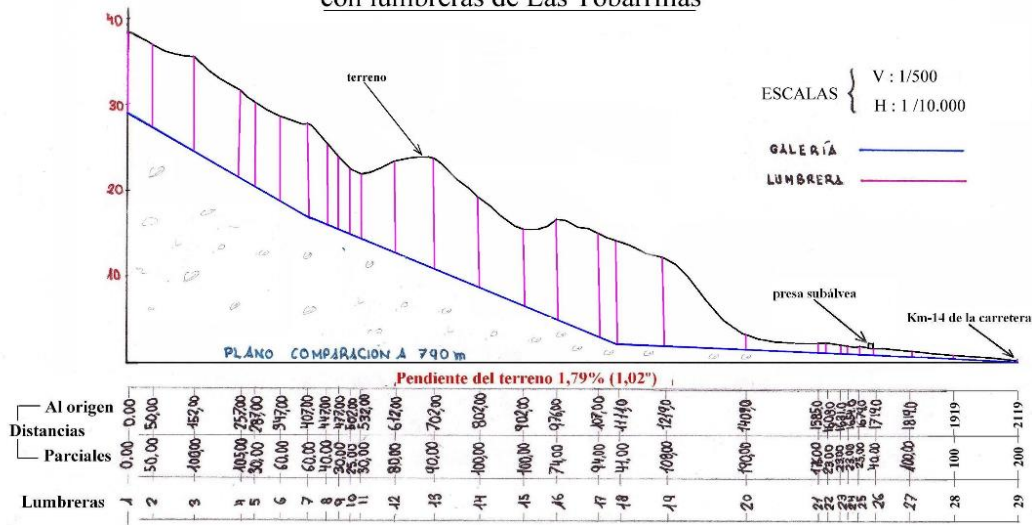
Features of Las Tobarrillas qanat (Yecla, Murcia)
